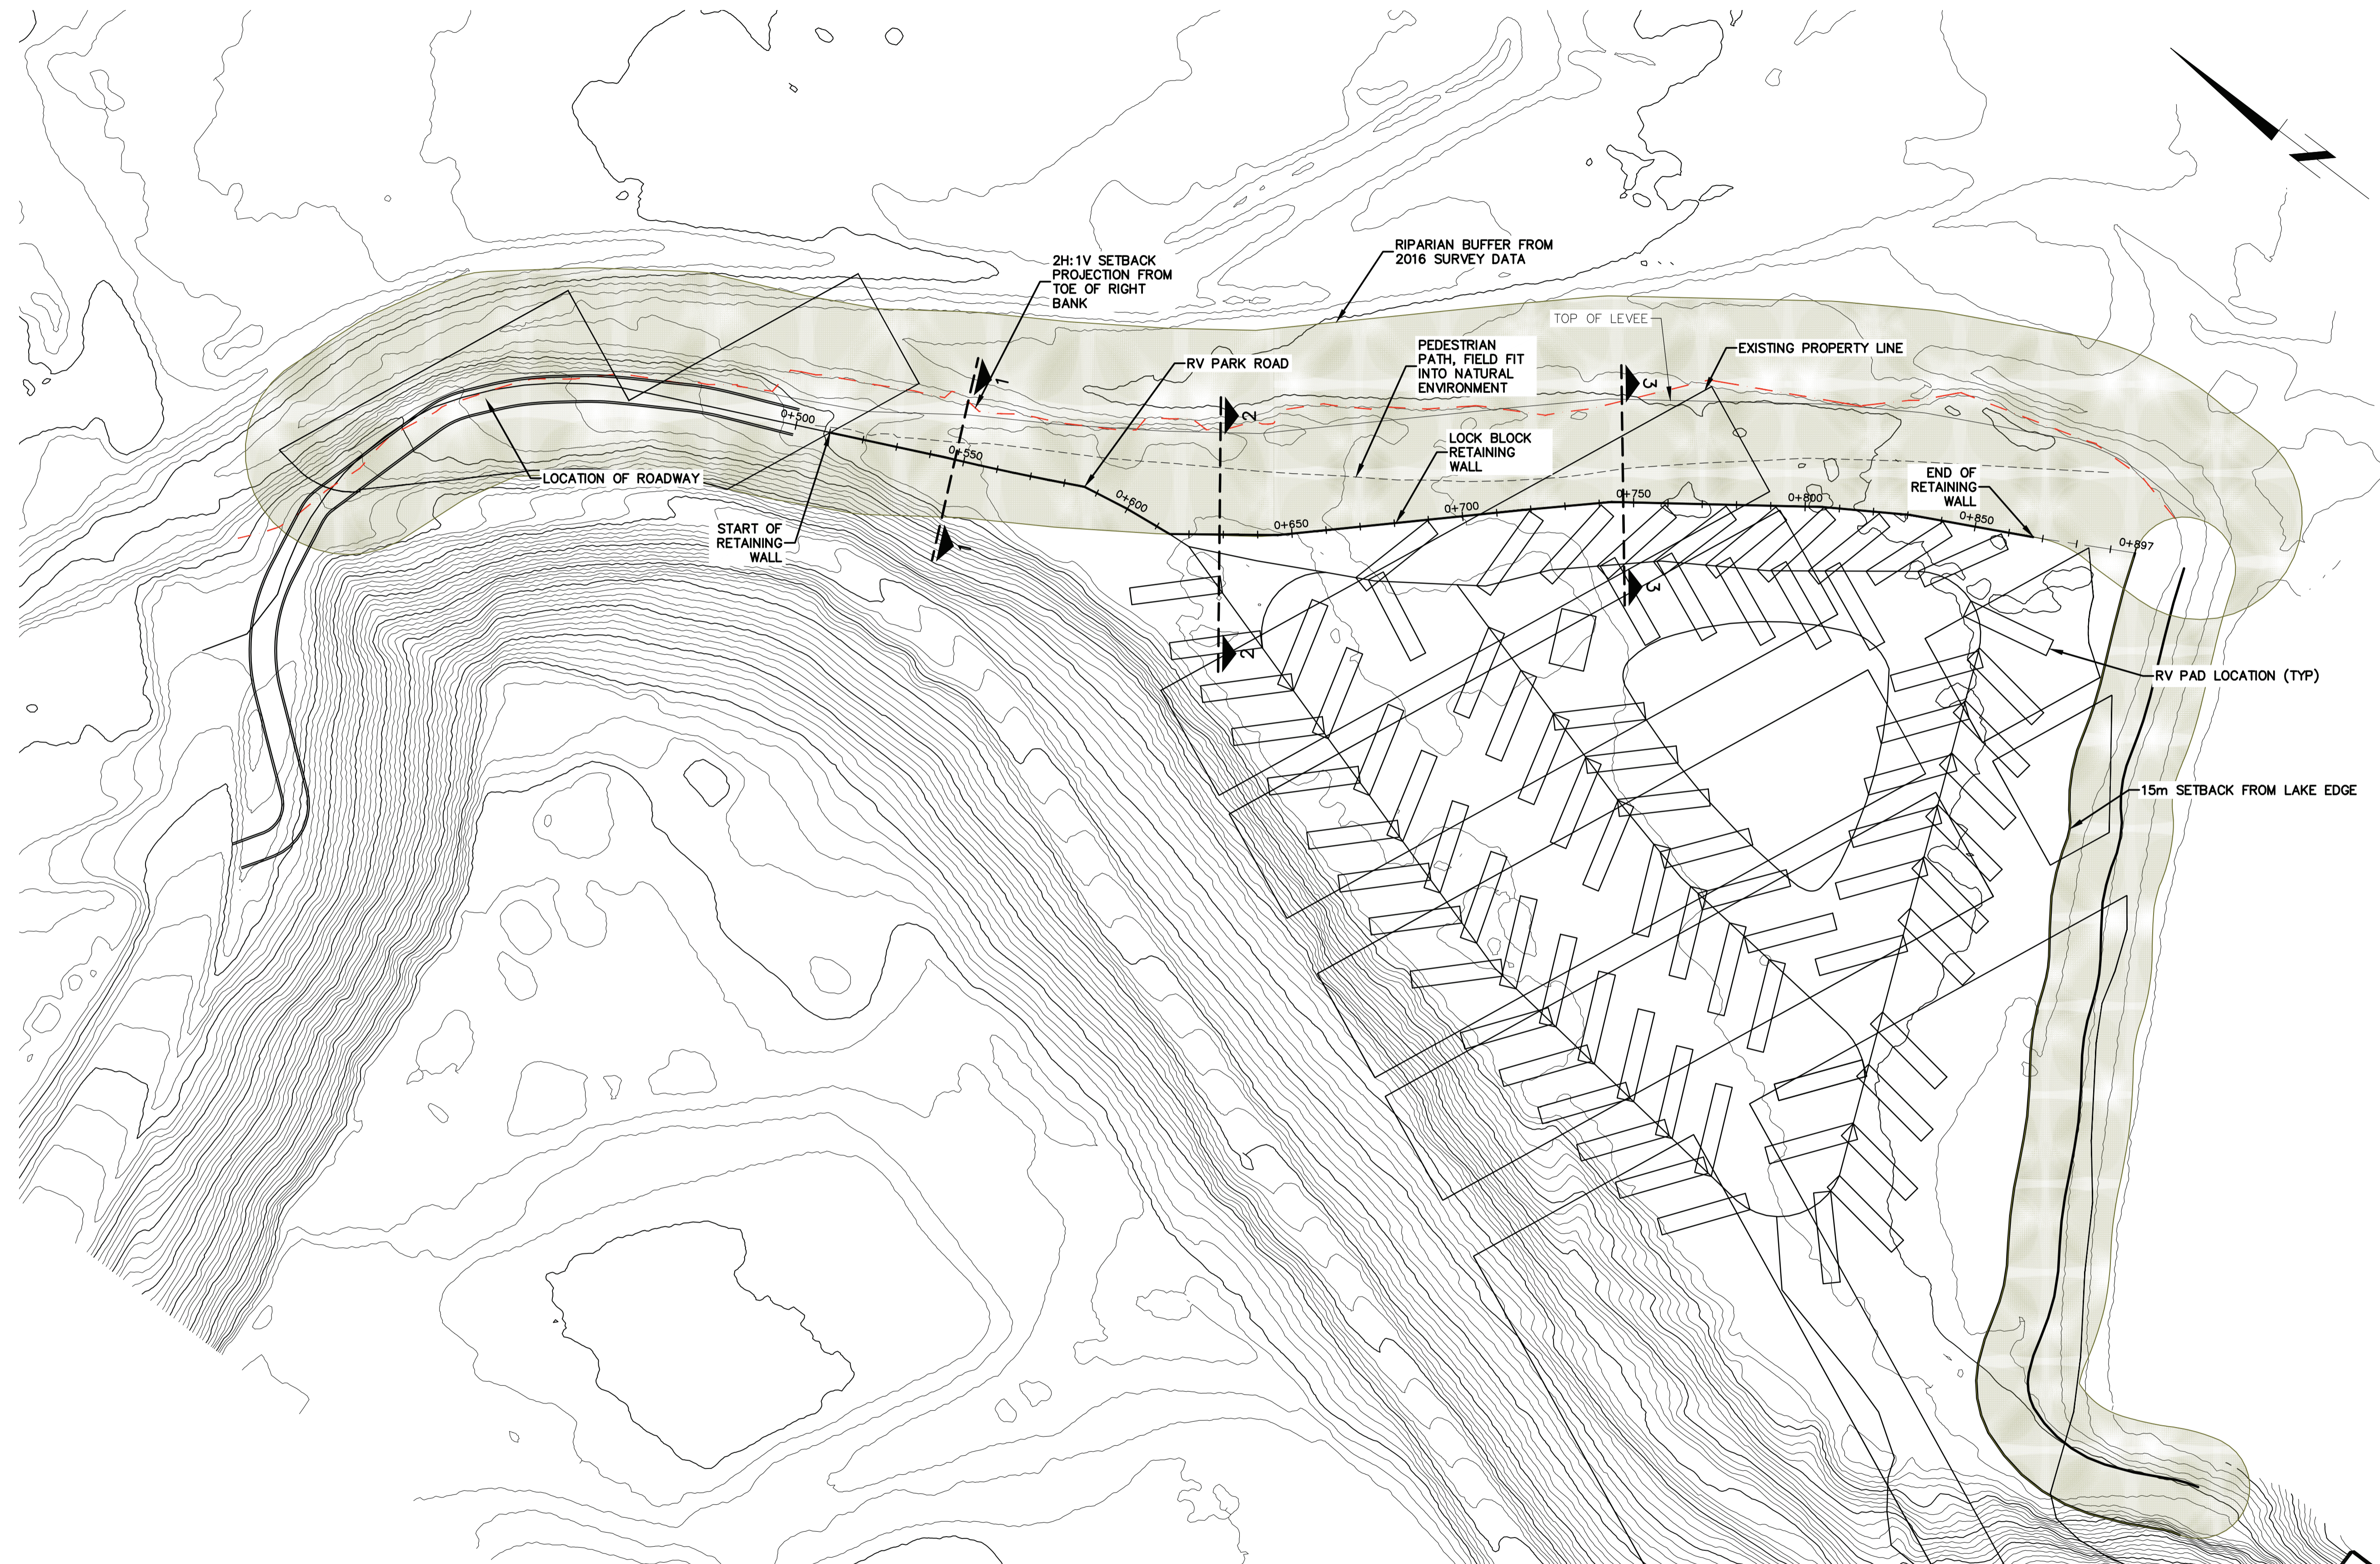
CTQ Proposed Flood Mitigation Site Plan
